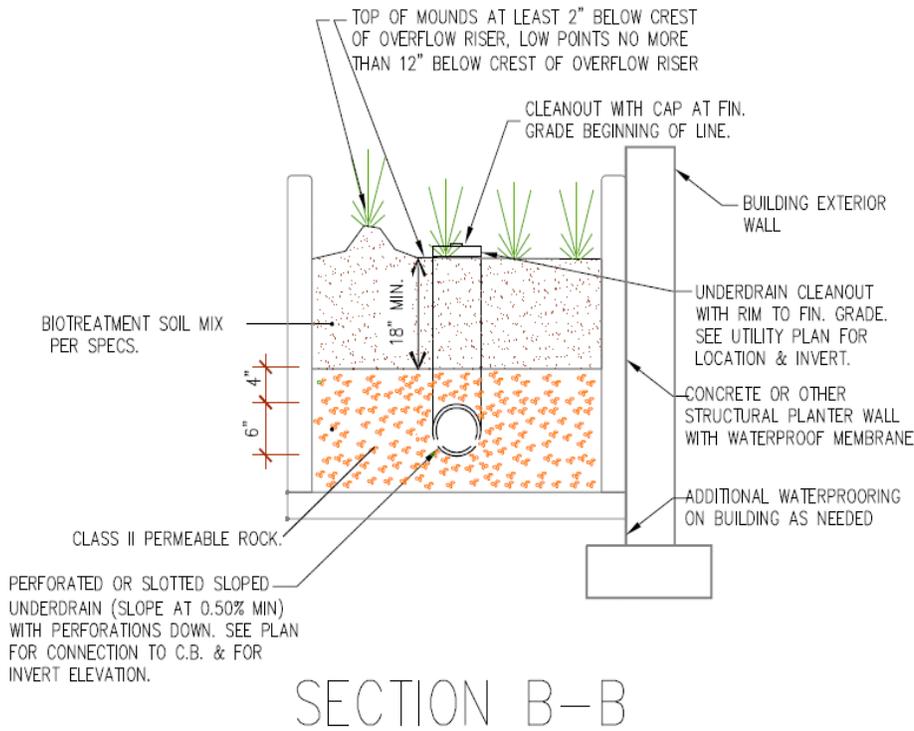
Cross section B-B of flow-through planter, shows cross section of underdrain
